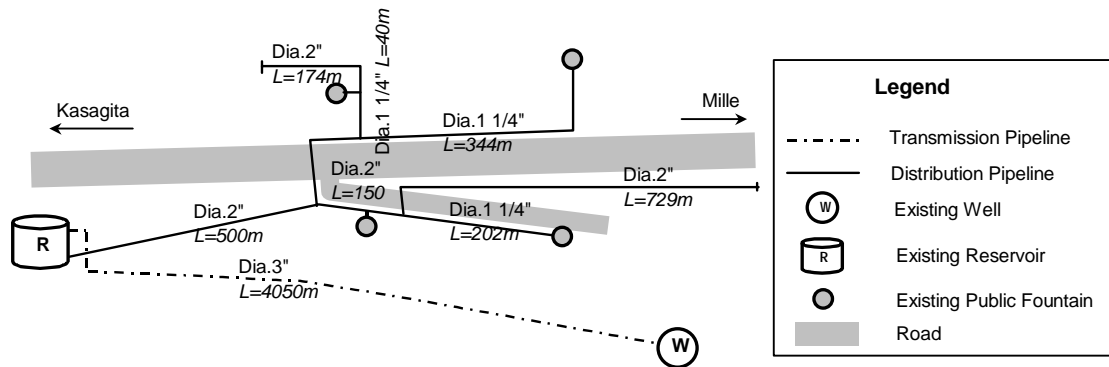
Layout of Existing Facilities of Eli Wuha
